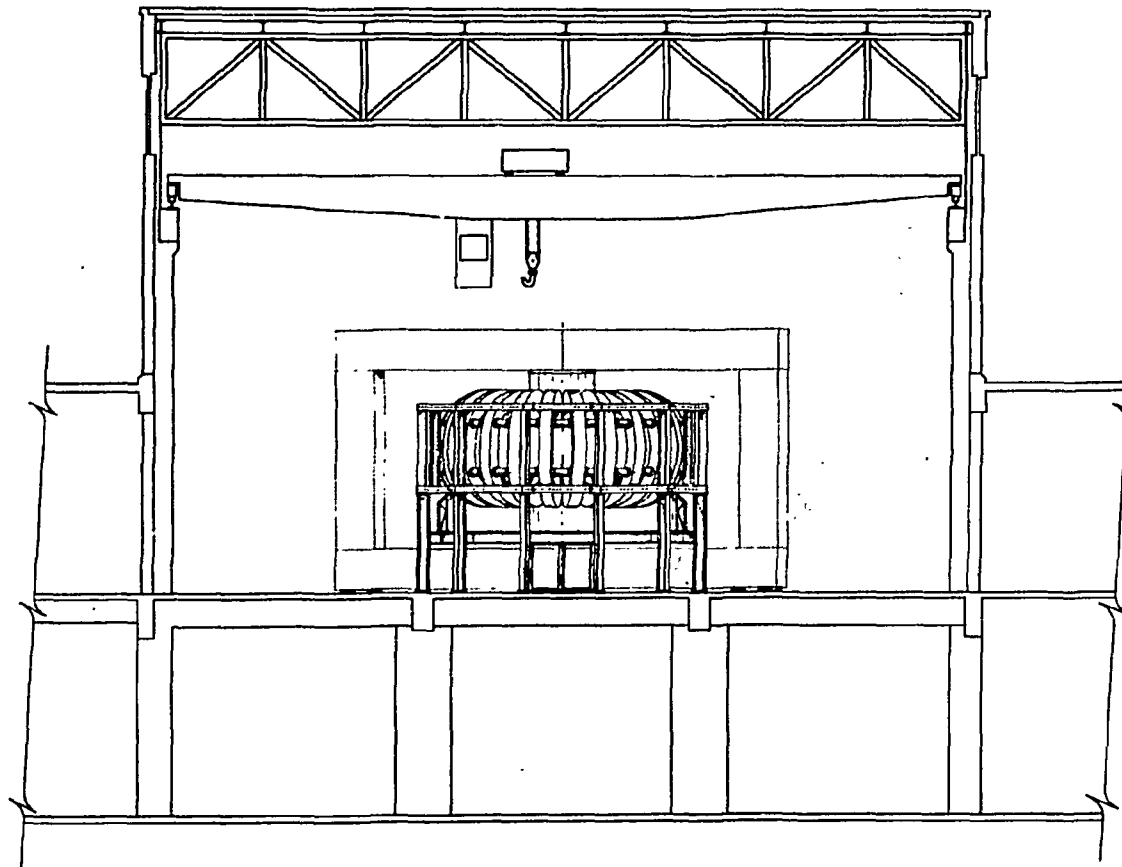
Building 9204-1 Section Showing Reference TTA Location
